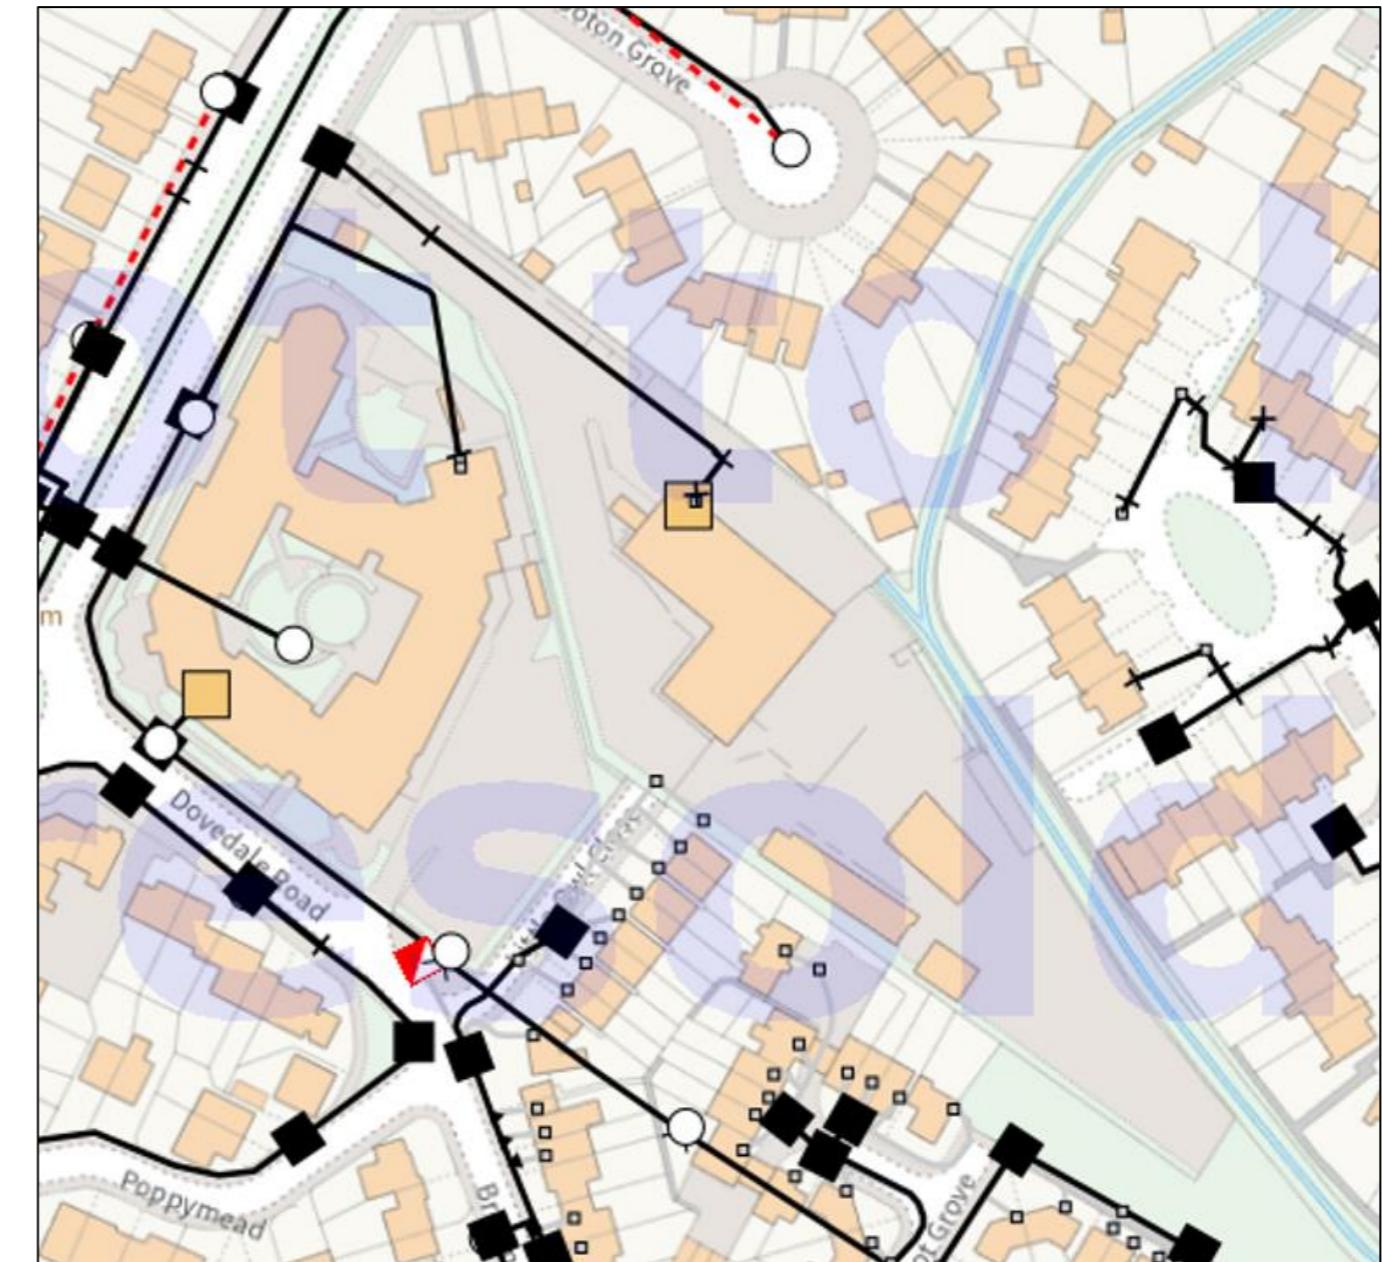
Plan of BT Openreach services running beneath College Road.
